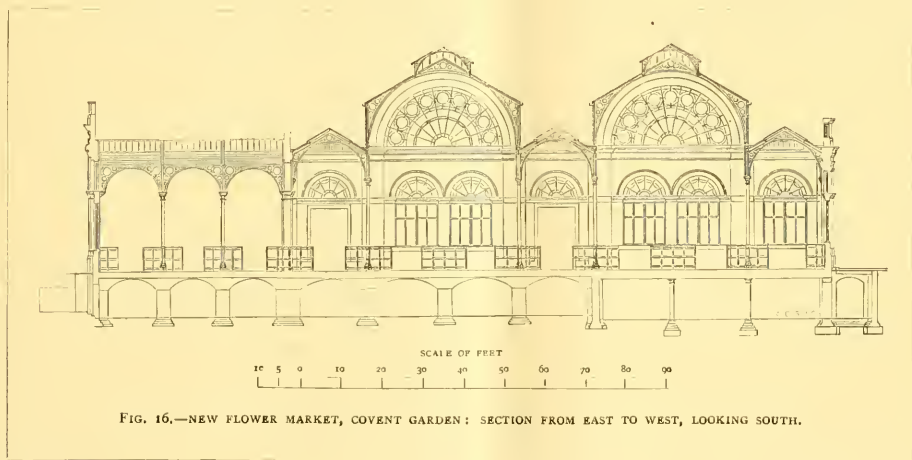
NEW FLOWER MARKET, COVENT GARDEN: SECTION FROM EAST TO WEST, LOOKING SOUTH.
